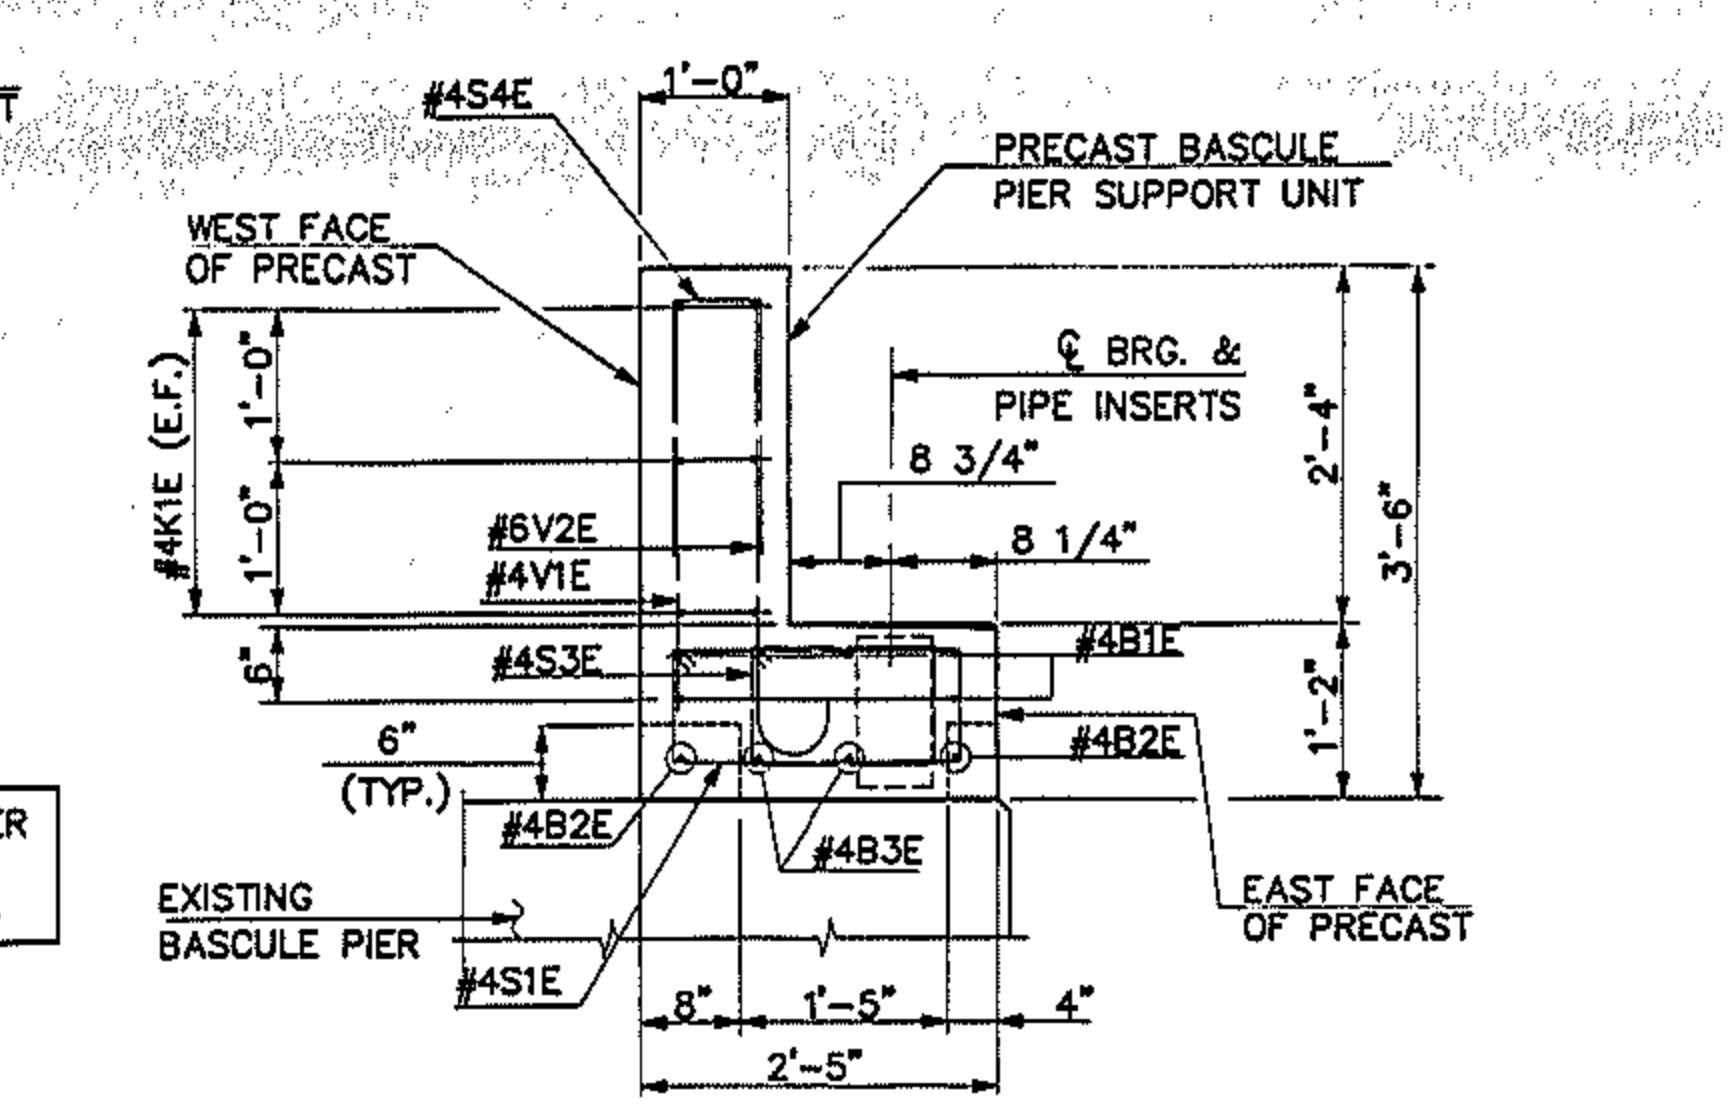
DETAILS OF ANCHORAGES @ EAST FACE OF BASCULE PIER SUPPORT
